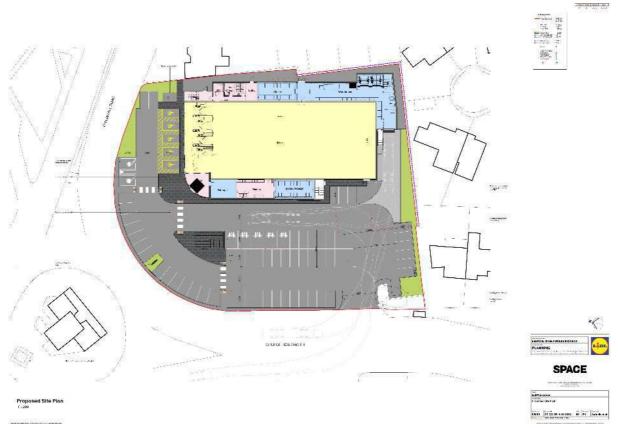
Extract of Site Plan with development site shown in red (Source: Space Architects 2020)
